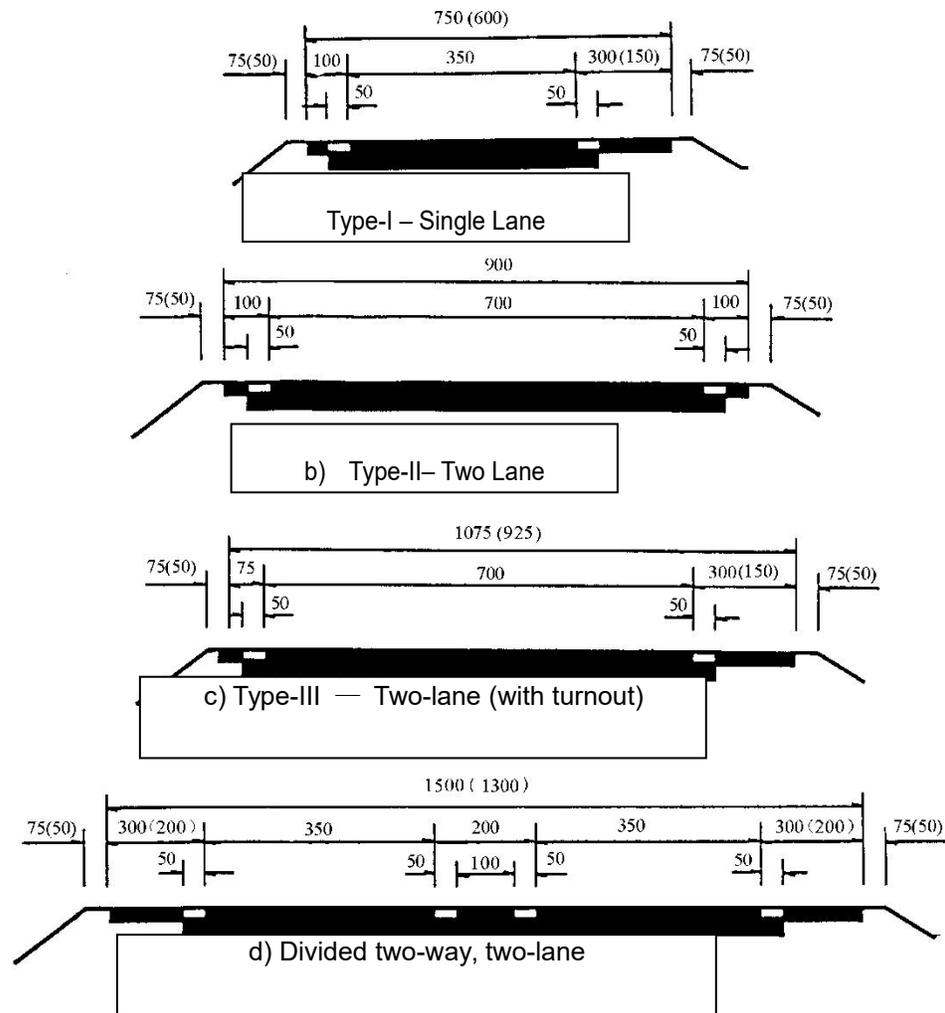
Basic Ramp roadway Cross-sections
